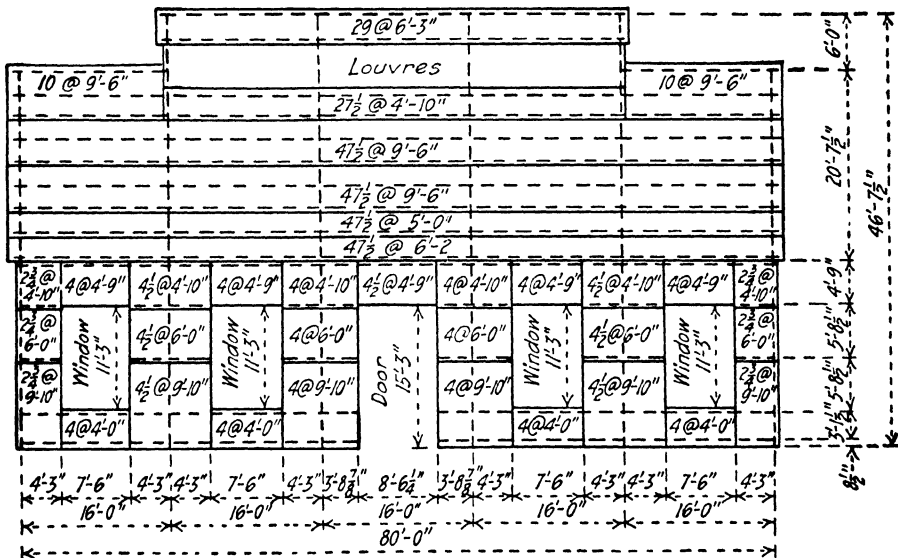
PLANS OF A STEEL TRANSFORMER BUILDING.
